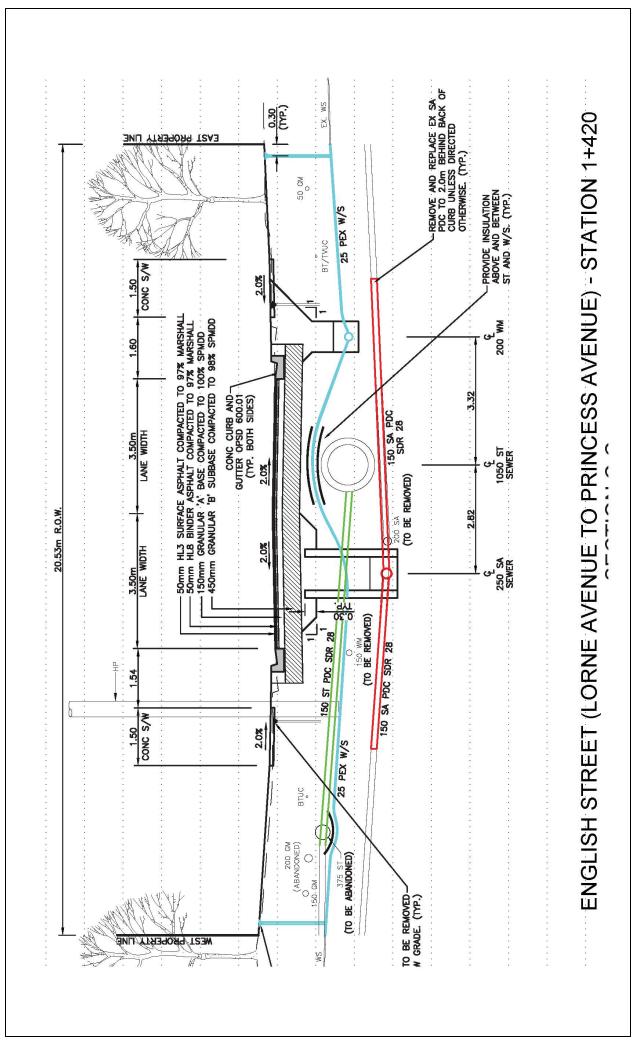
Cross-section of English Street Infrastructure Renewal Project for English Street between Lorne Avenue and Princess Avenue.
